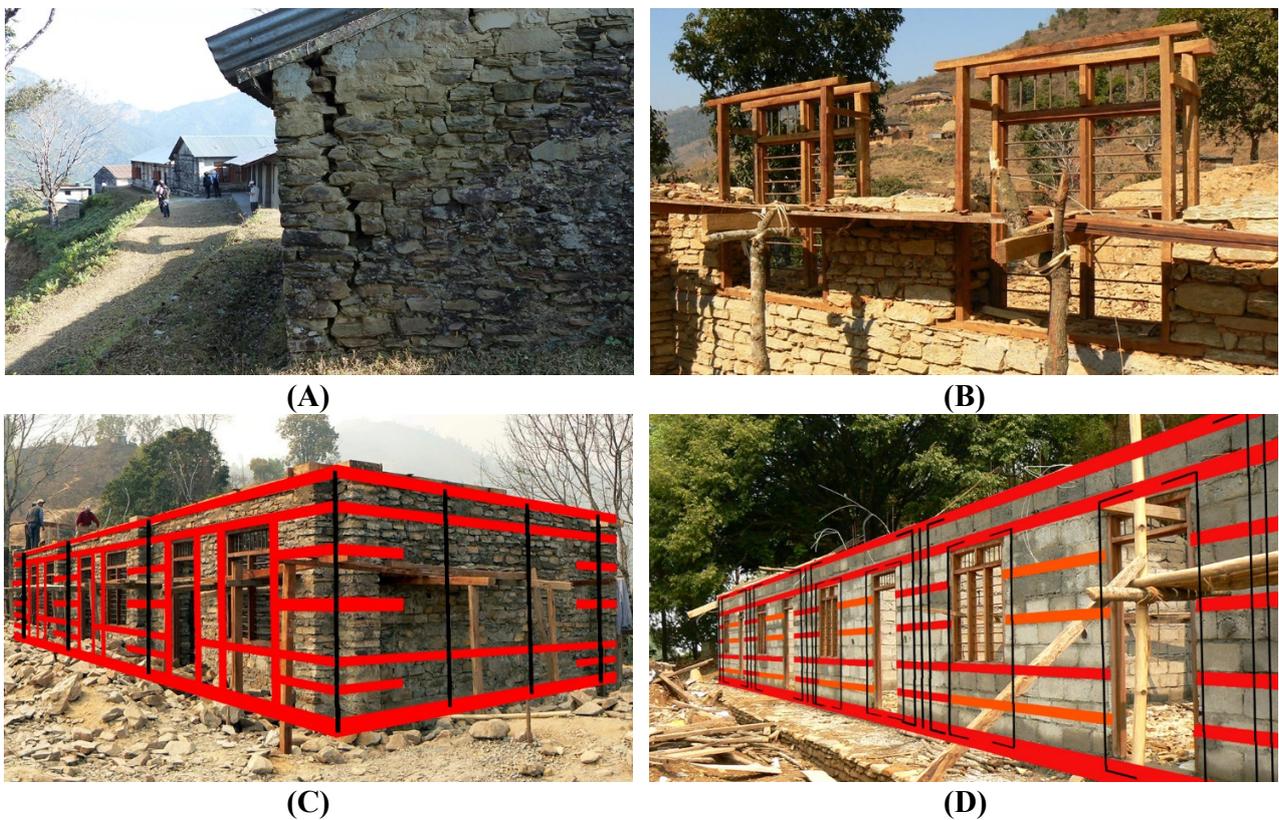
(A) Traditional school building without horizontal reinforcements. (B) Double frames for doors and windows. (C) Rubble stone walls with extra horizontal stitches, additional vertical steel and boxed openings. (D) Concrete block walls with extra stitches and unreinforced concrete fillers (all by courtesy of Smart Shelter Research).
